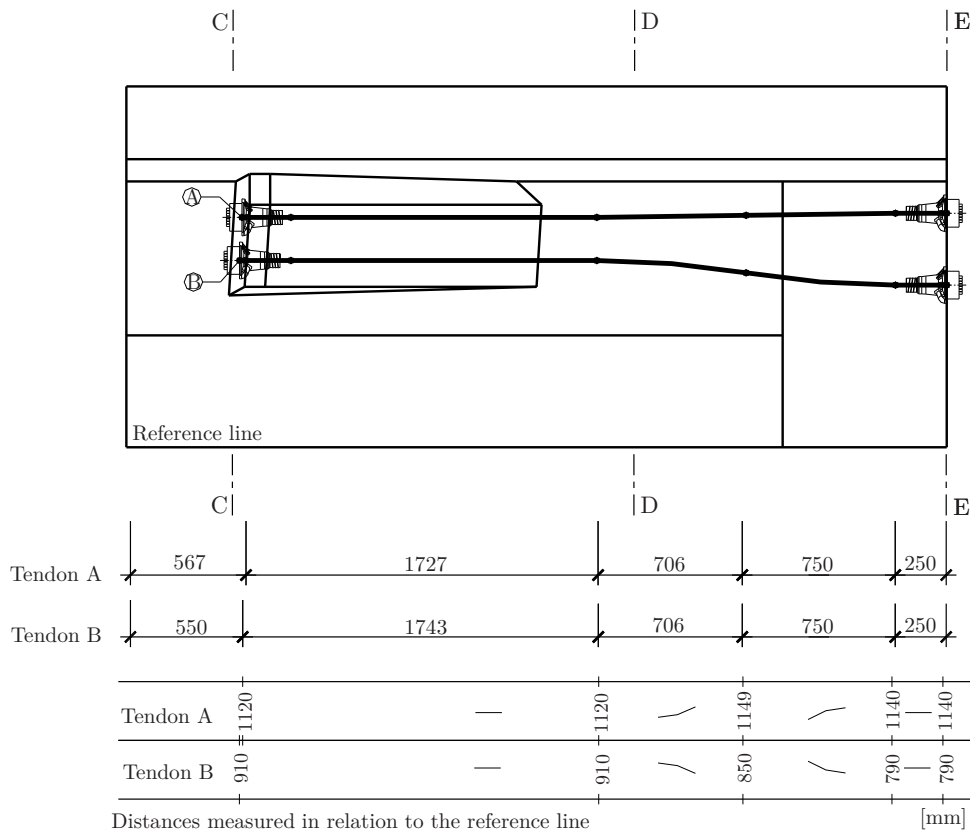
HPFRC blister model post-tensioning tendons layout - plan view
